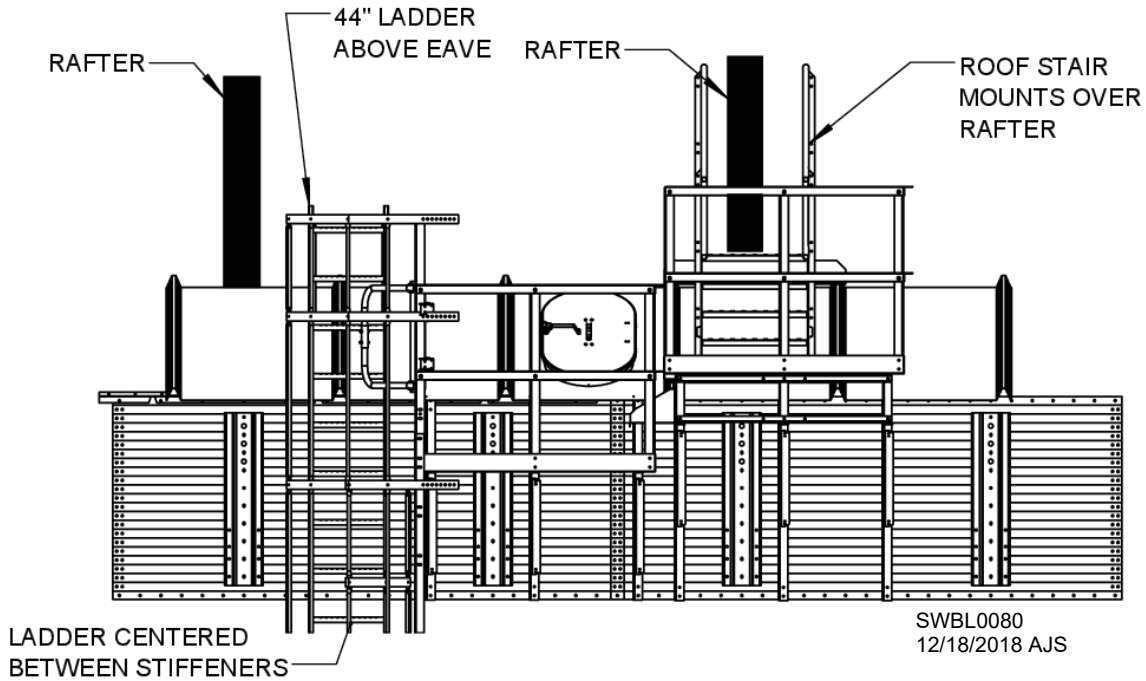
Ladder & platform locations with 2 stiffeners & 3 roof sheets per sidewall sheet
